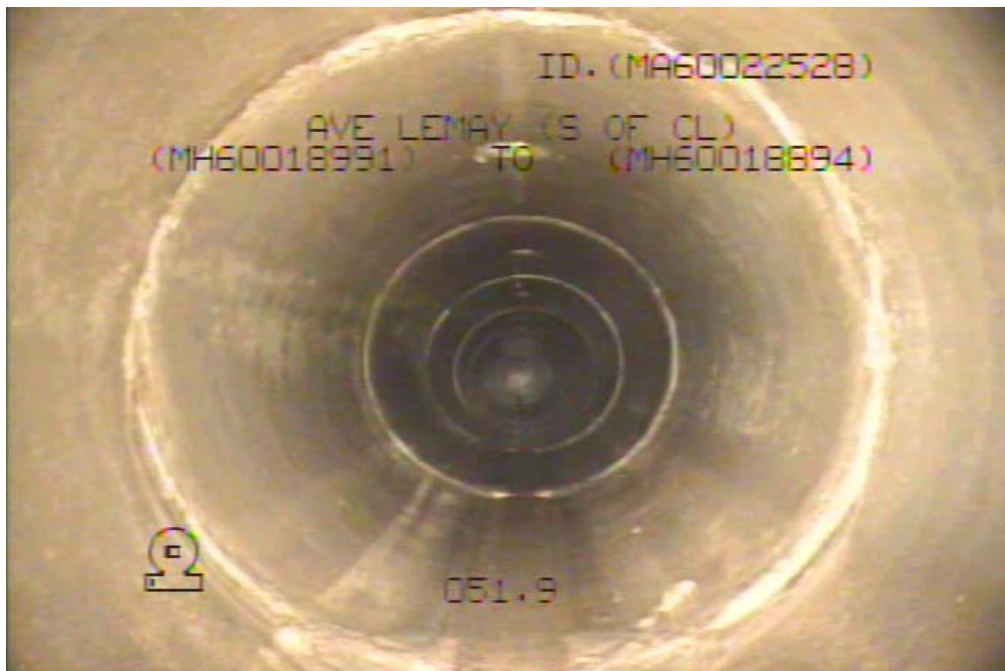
900 mm concrete land drainage sewer pipe in good condition.
